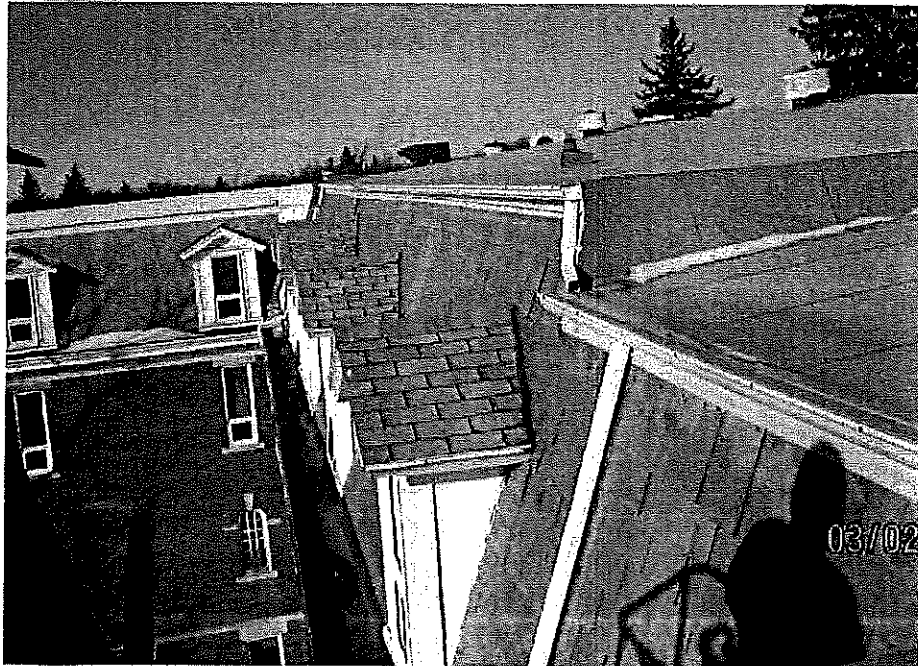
South façade – roof caulk at dormers; missing top row of slates (note asphalt shingles on dormers and no metal flashing)
